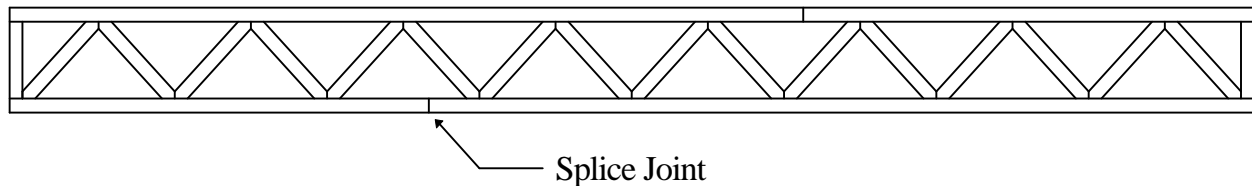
Typical bottom chord splice joint in a parallel chord roof truss.
